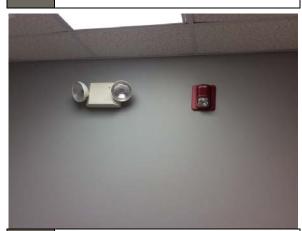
PHOTO BACKUP LIGHT FIXTURE AND STROBE ALARM
